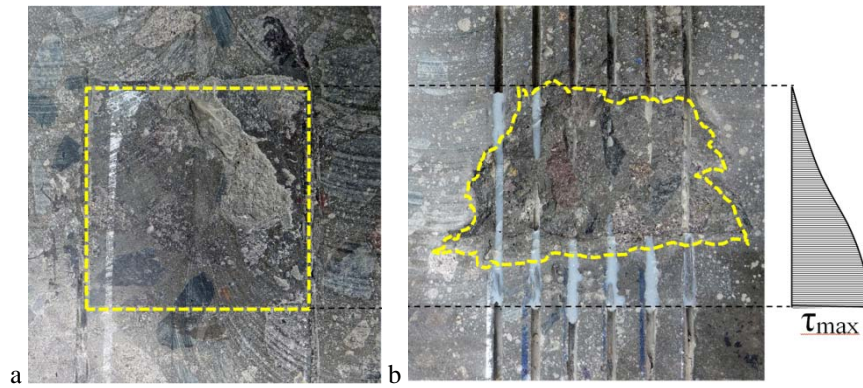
Shear-bond and concrete-shear failure; (a) De-bonding failure; (b) Concrete-shear failure.
